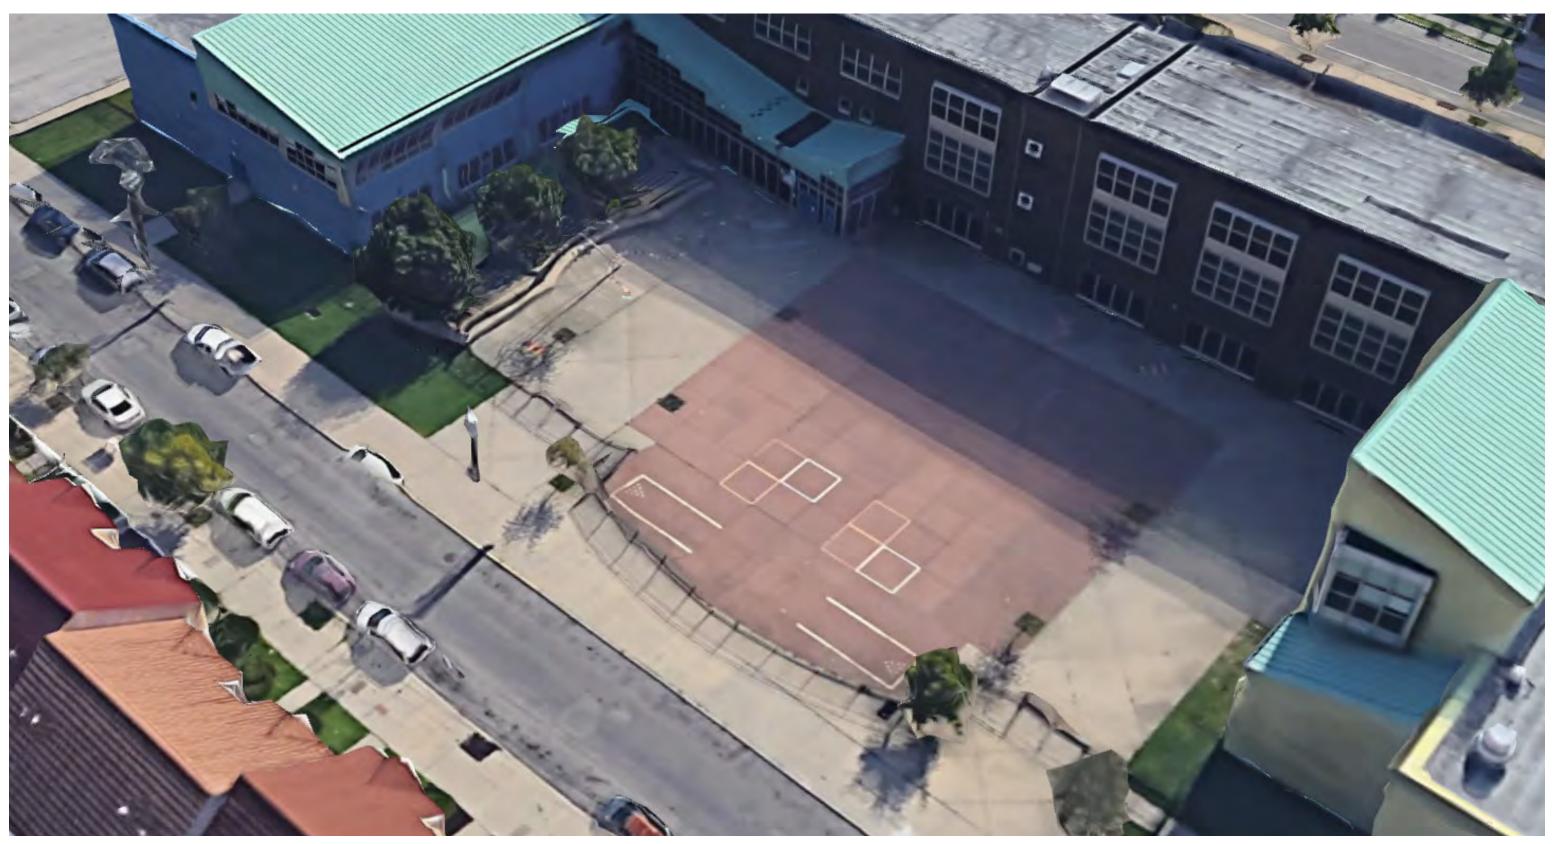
Existing Right-of-Way Sidewalk Adjacent to Schoolyard; Location of Proposed Urban Forest (right) to Buffer Schoolyard from Street
